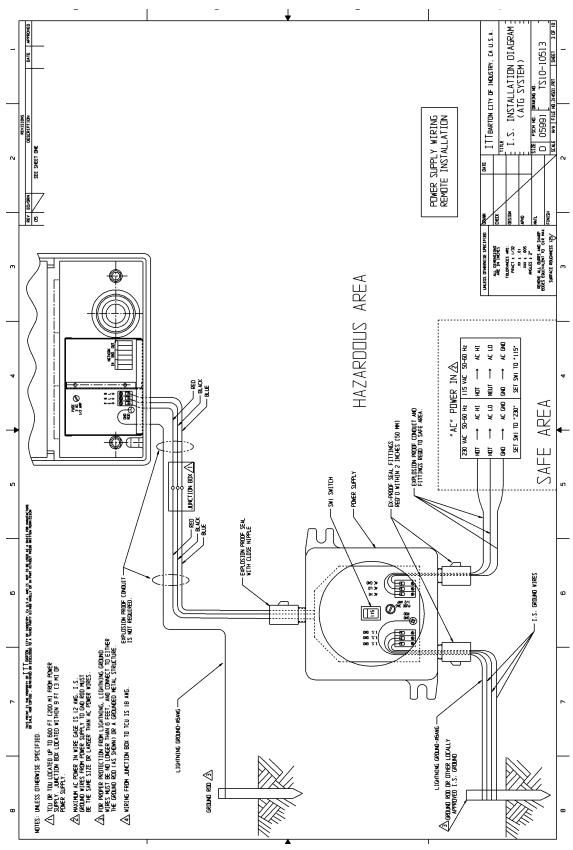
Wiring Drawing TS10-10513 (3/10)
